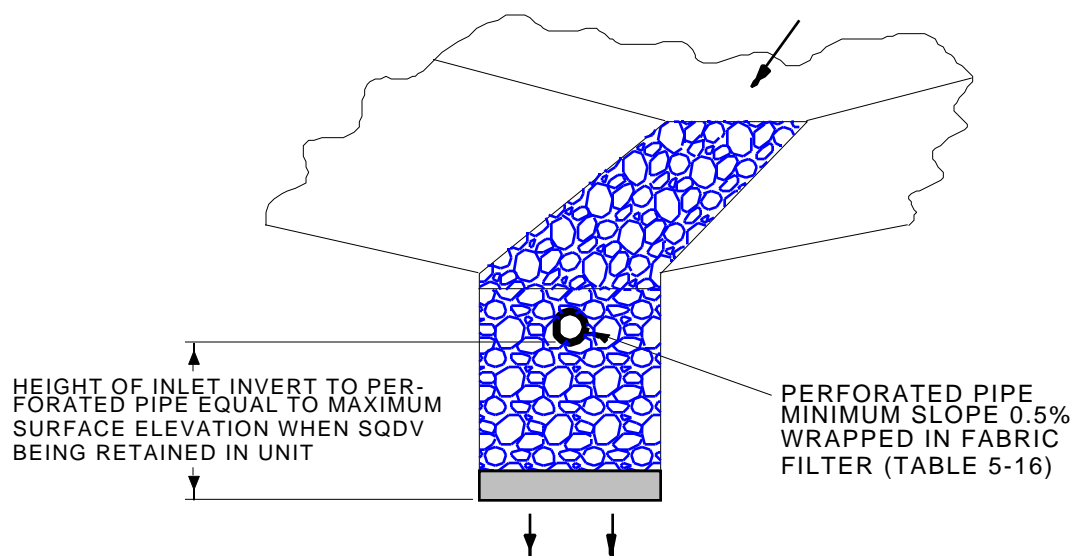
Illustration of Pipe Bypass in Infiltration Trench
